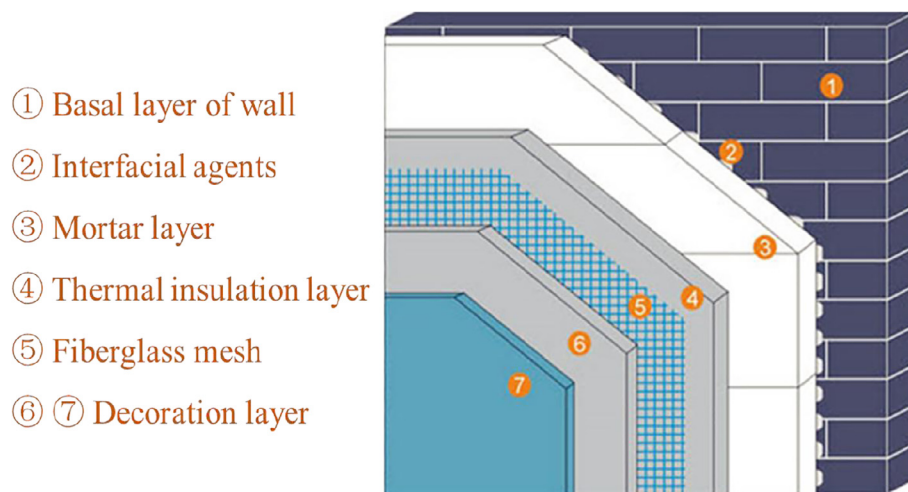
Sketch diagram of external wall insulation structure of buildings.
